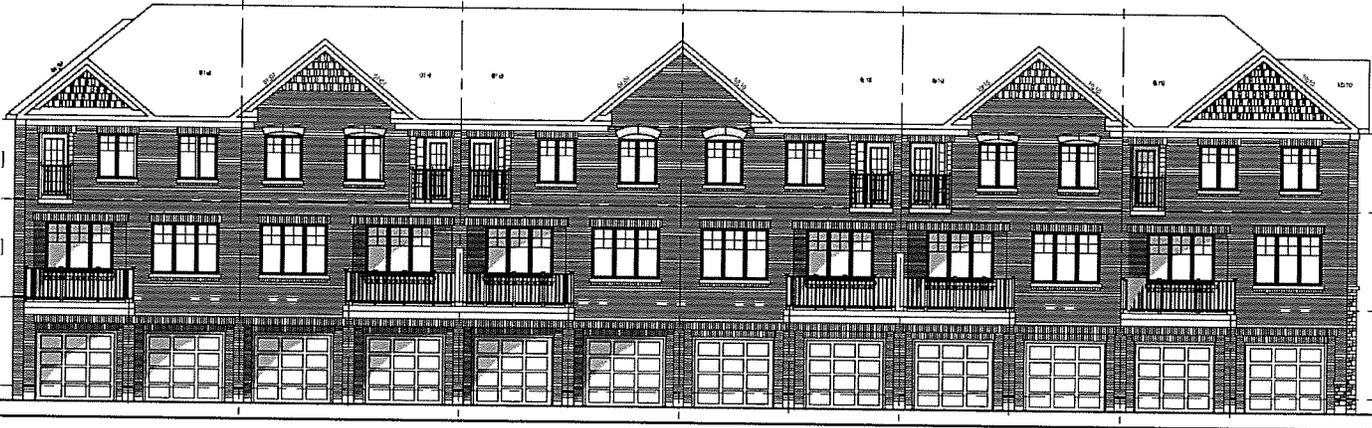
Conceptual Elevations (Sheet 6 of 6)
